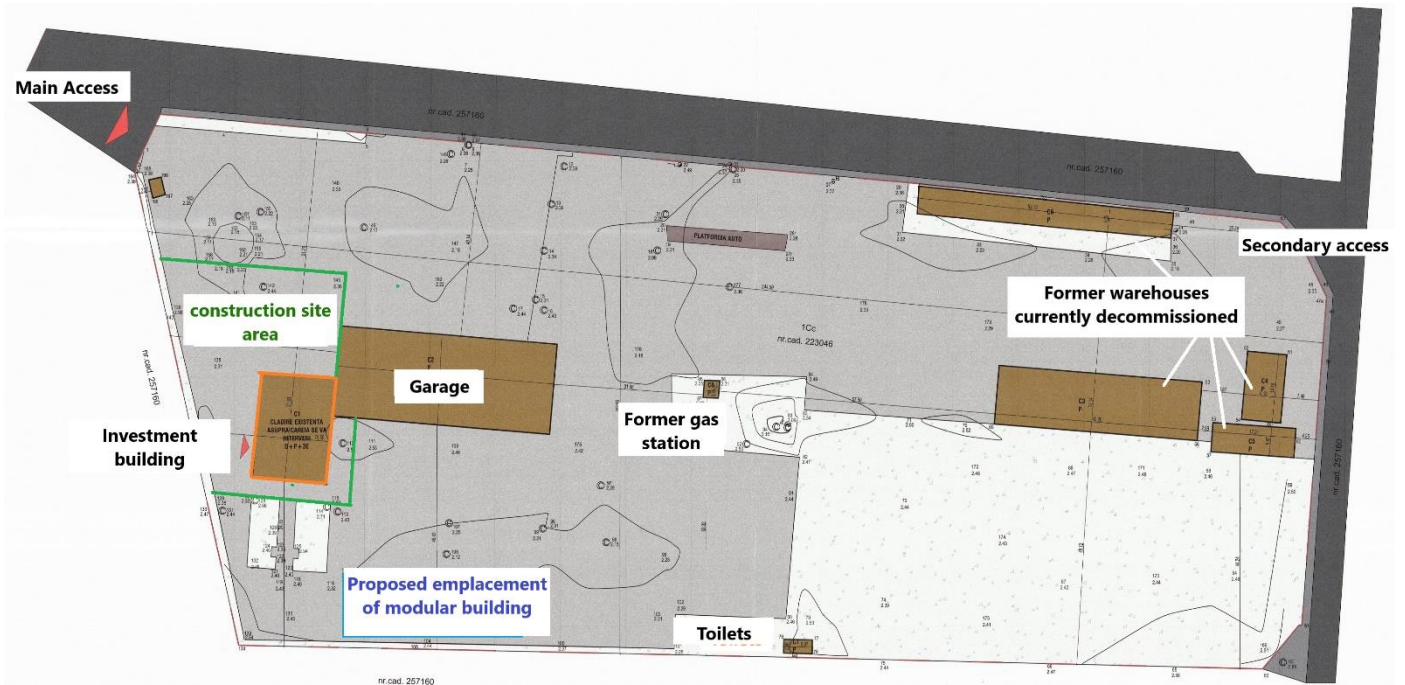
The existing buildings and the proposed positioning of the relocation building and construction area on the land plot of the unit.
